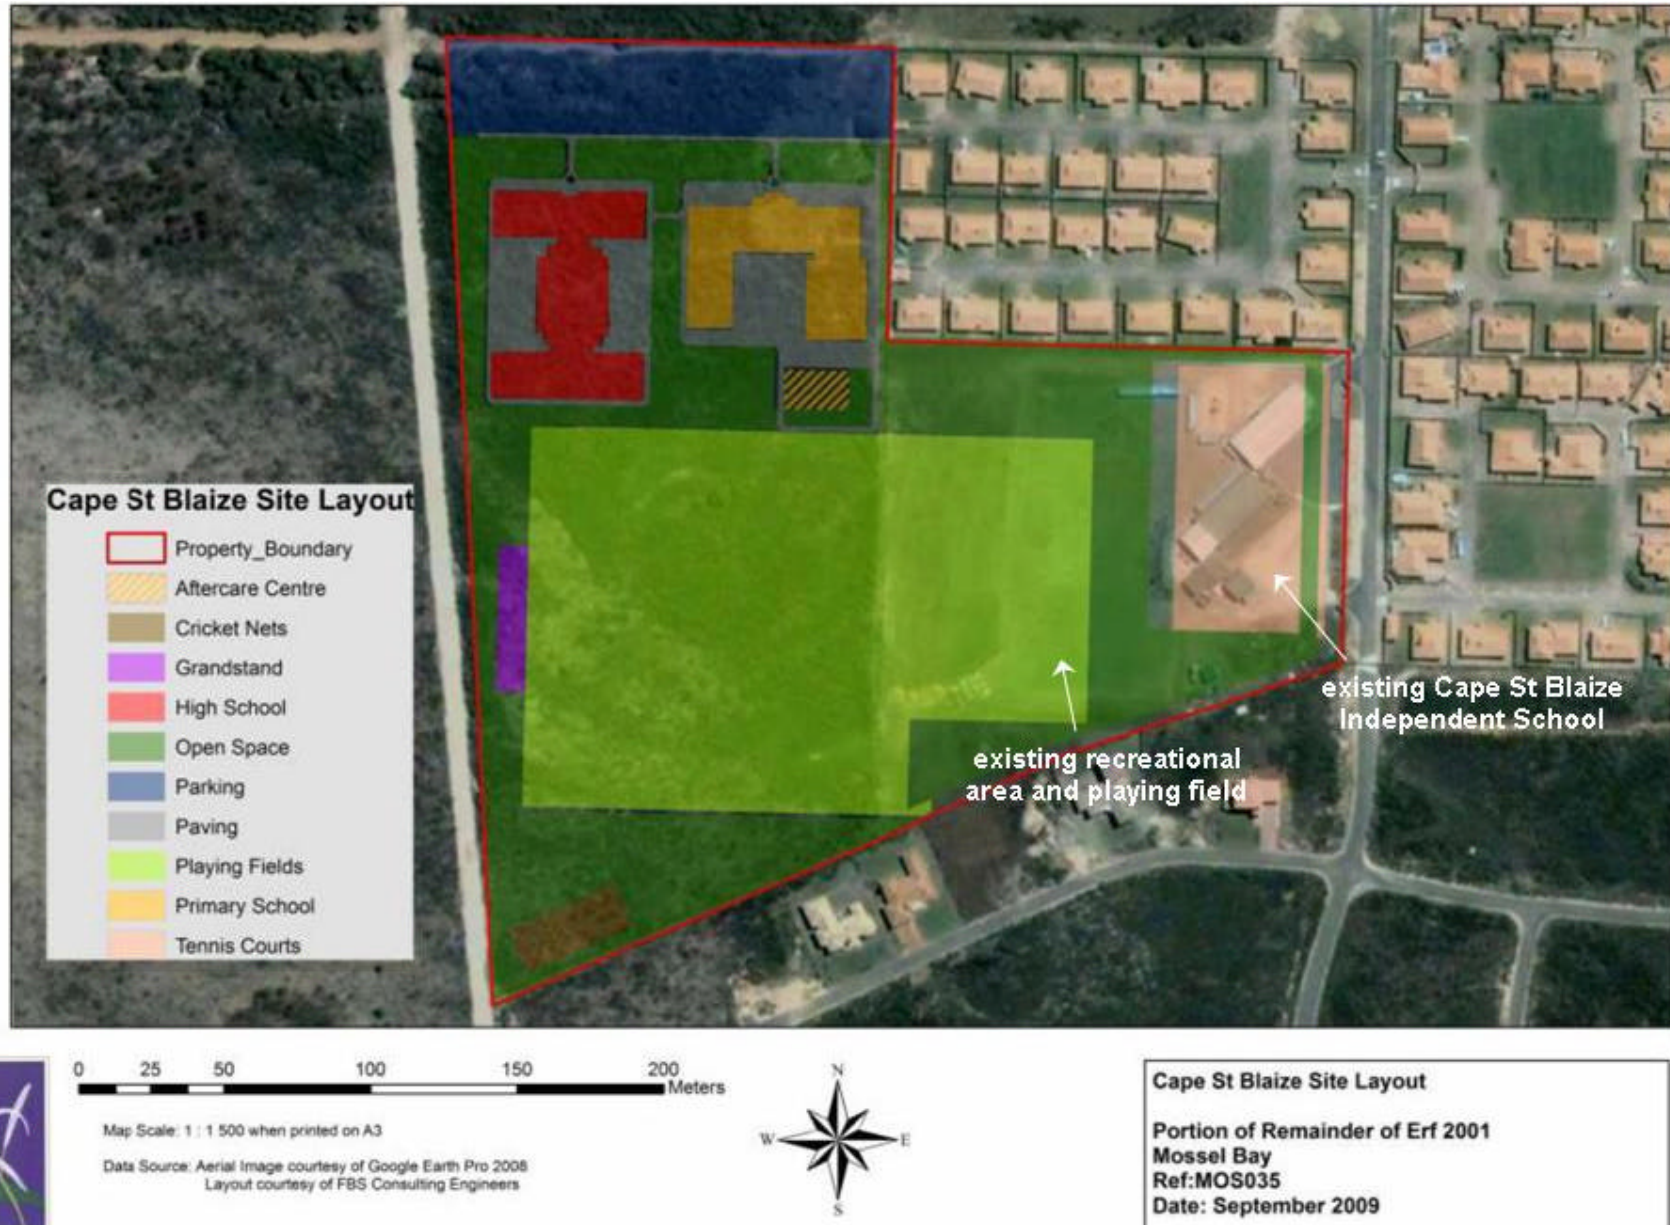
Layout plan for proposed upgrading and expansion of Cape St Blaize Independent School. (Figs 2 & 3 courtesy Cape EAPRAC)
